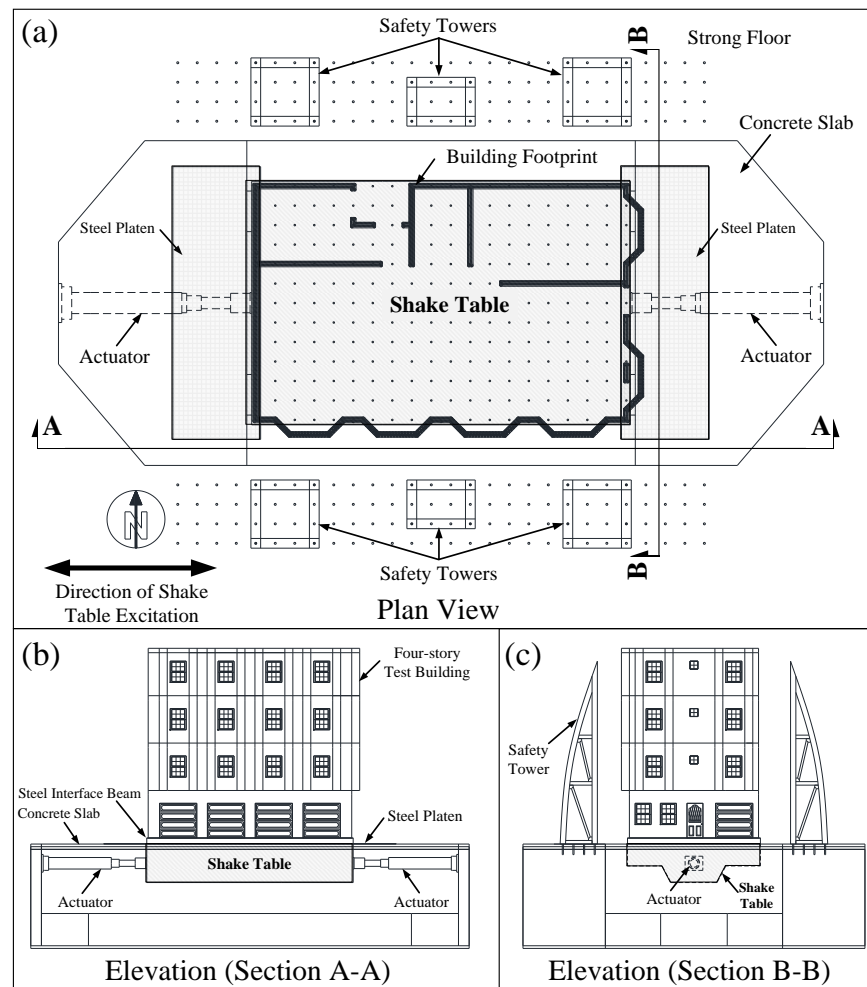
Position of the four-story building on top of the shake table: (a) plan view, (b) south elevation view (Section A-A), (c) west elevation view (Section B-B).
